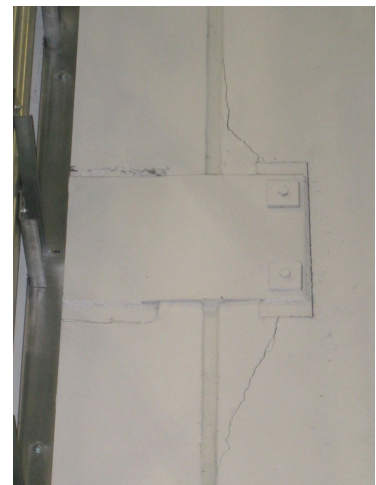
Panel to Panel Restraint Cracking (Lawson and Steinbicker)
